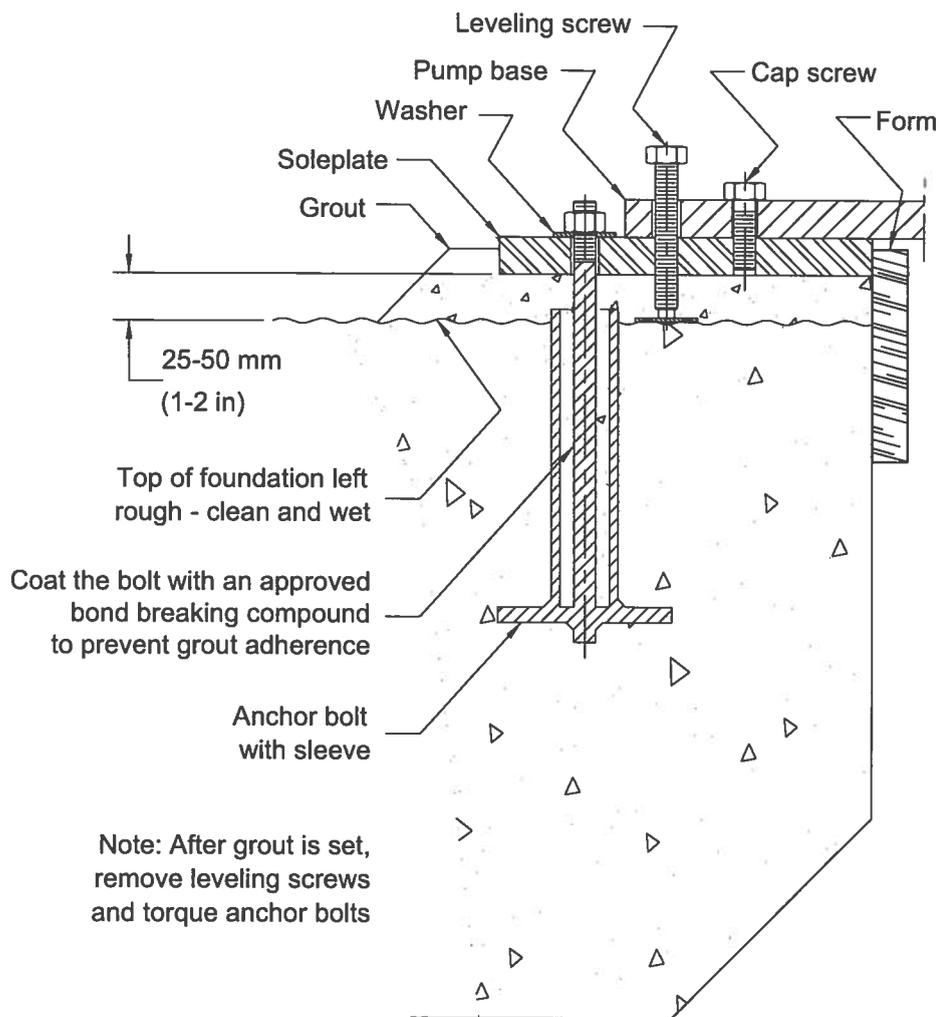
Typical foundation bolt, leveling screw, and grout details
